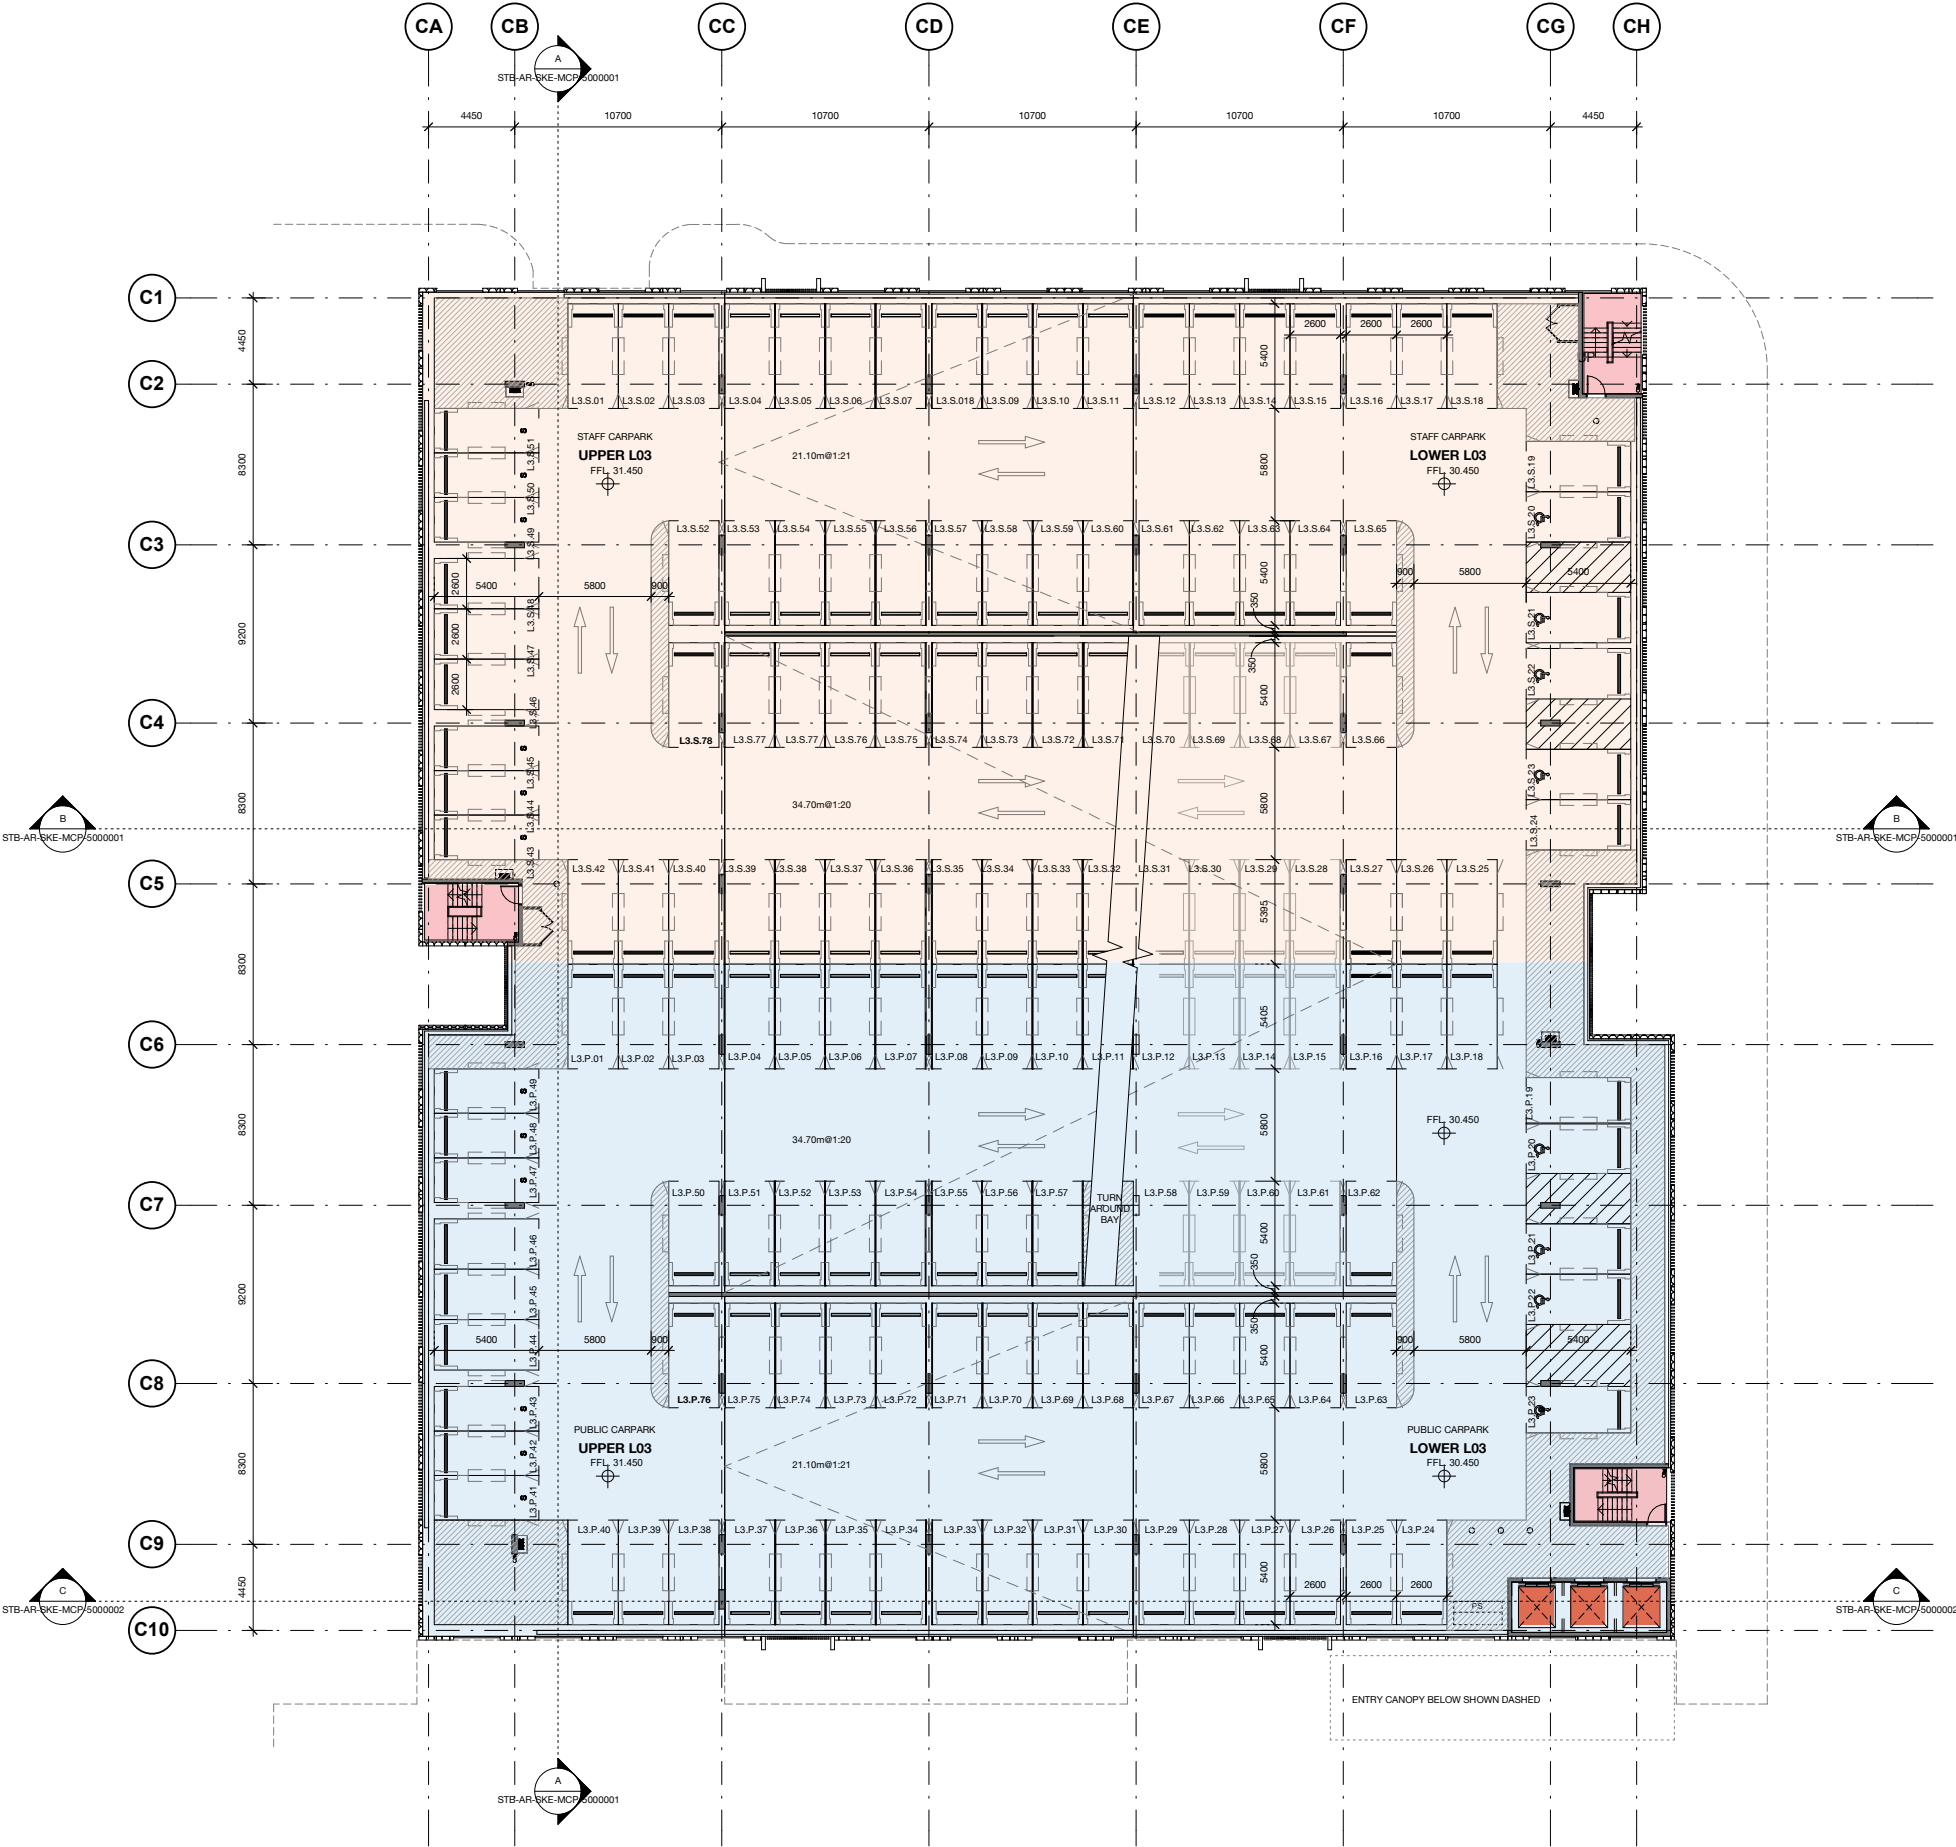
Multi-Deck Carpark, Floor Plan - Level 3
